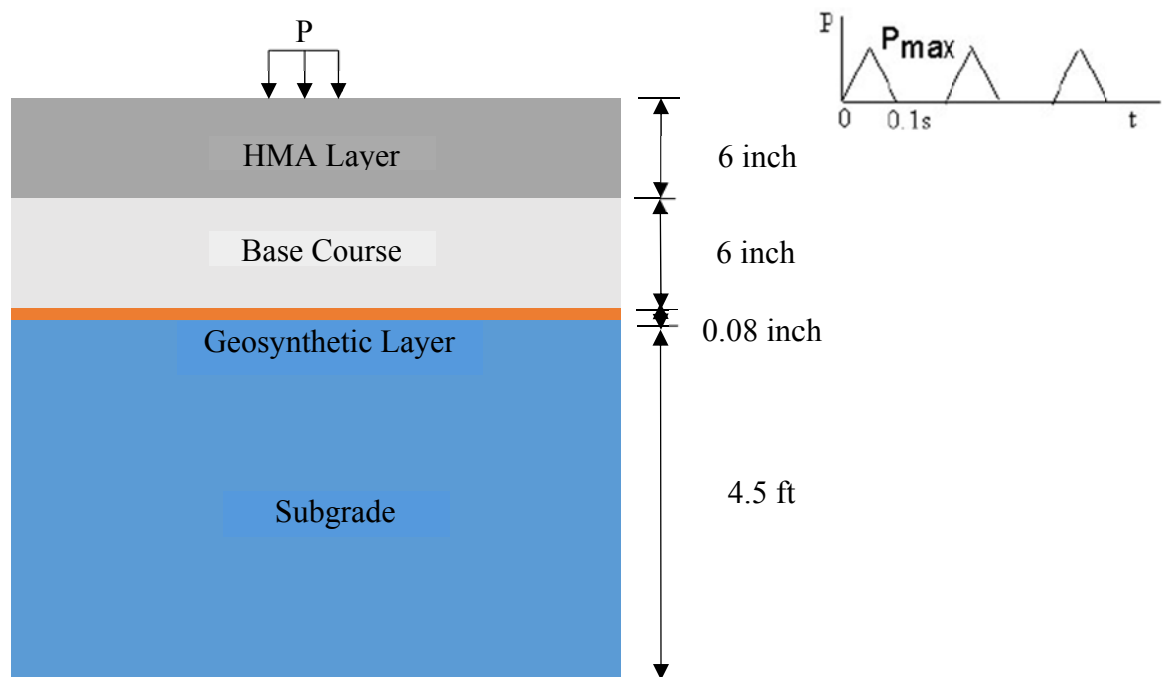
Typical Geosynthetic-Reinforced Flexible Pavement Structure in LST Test
